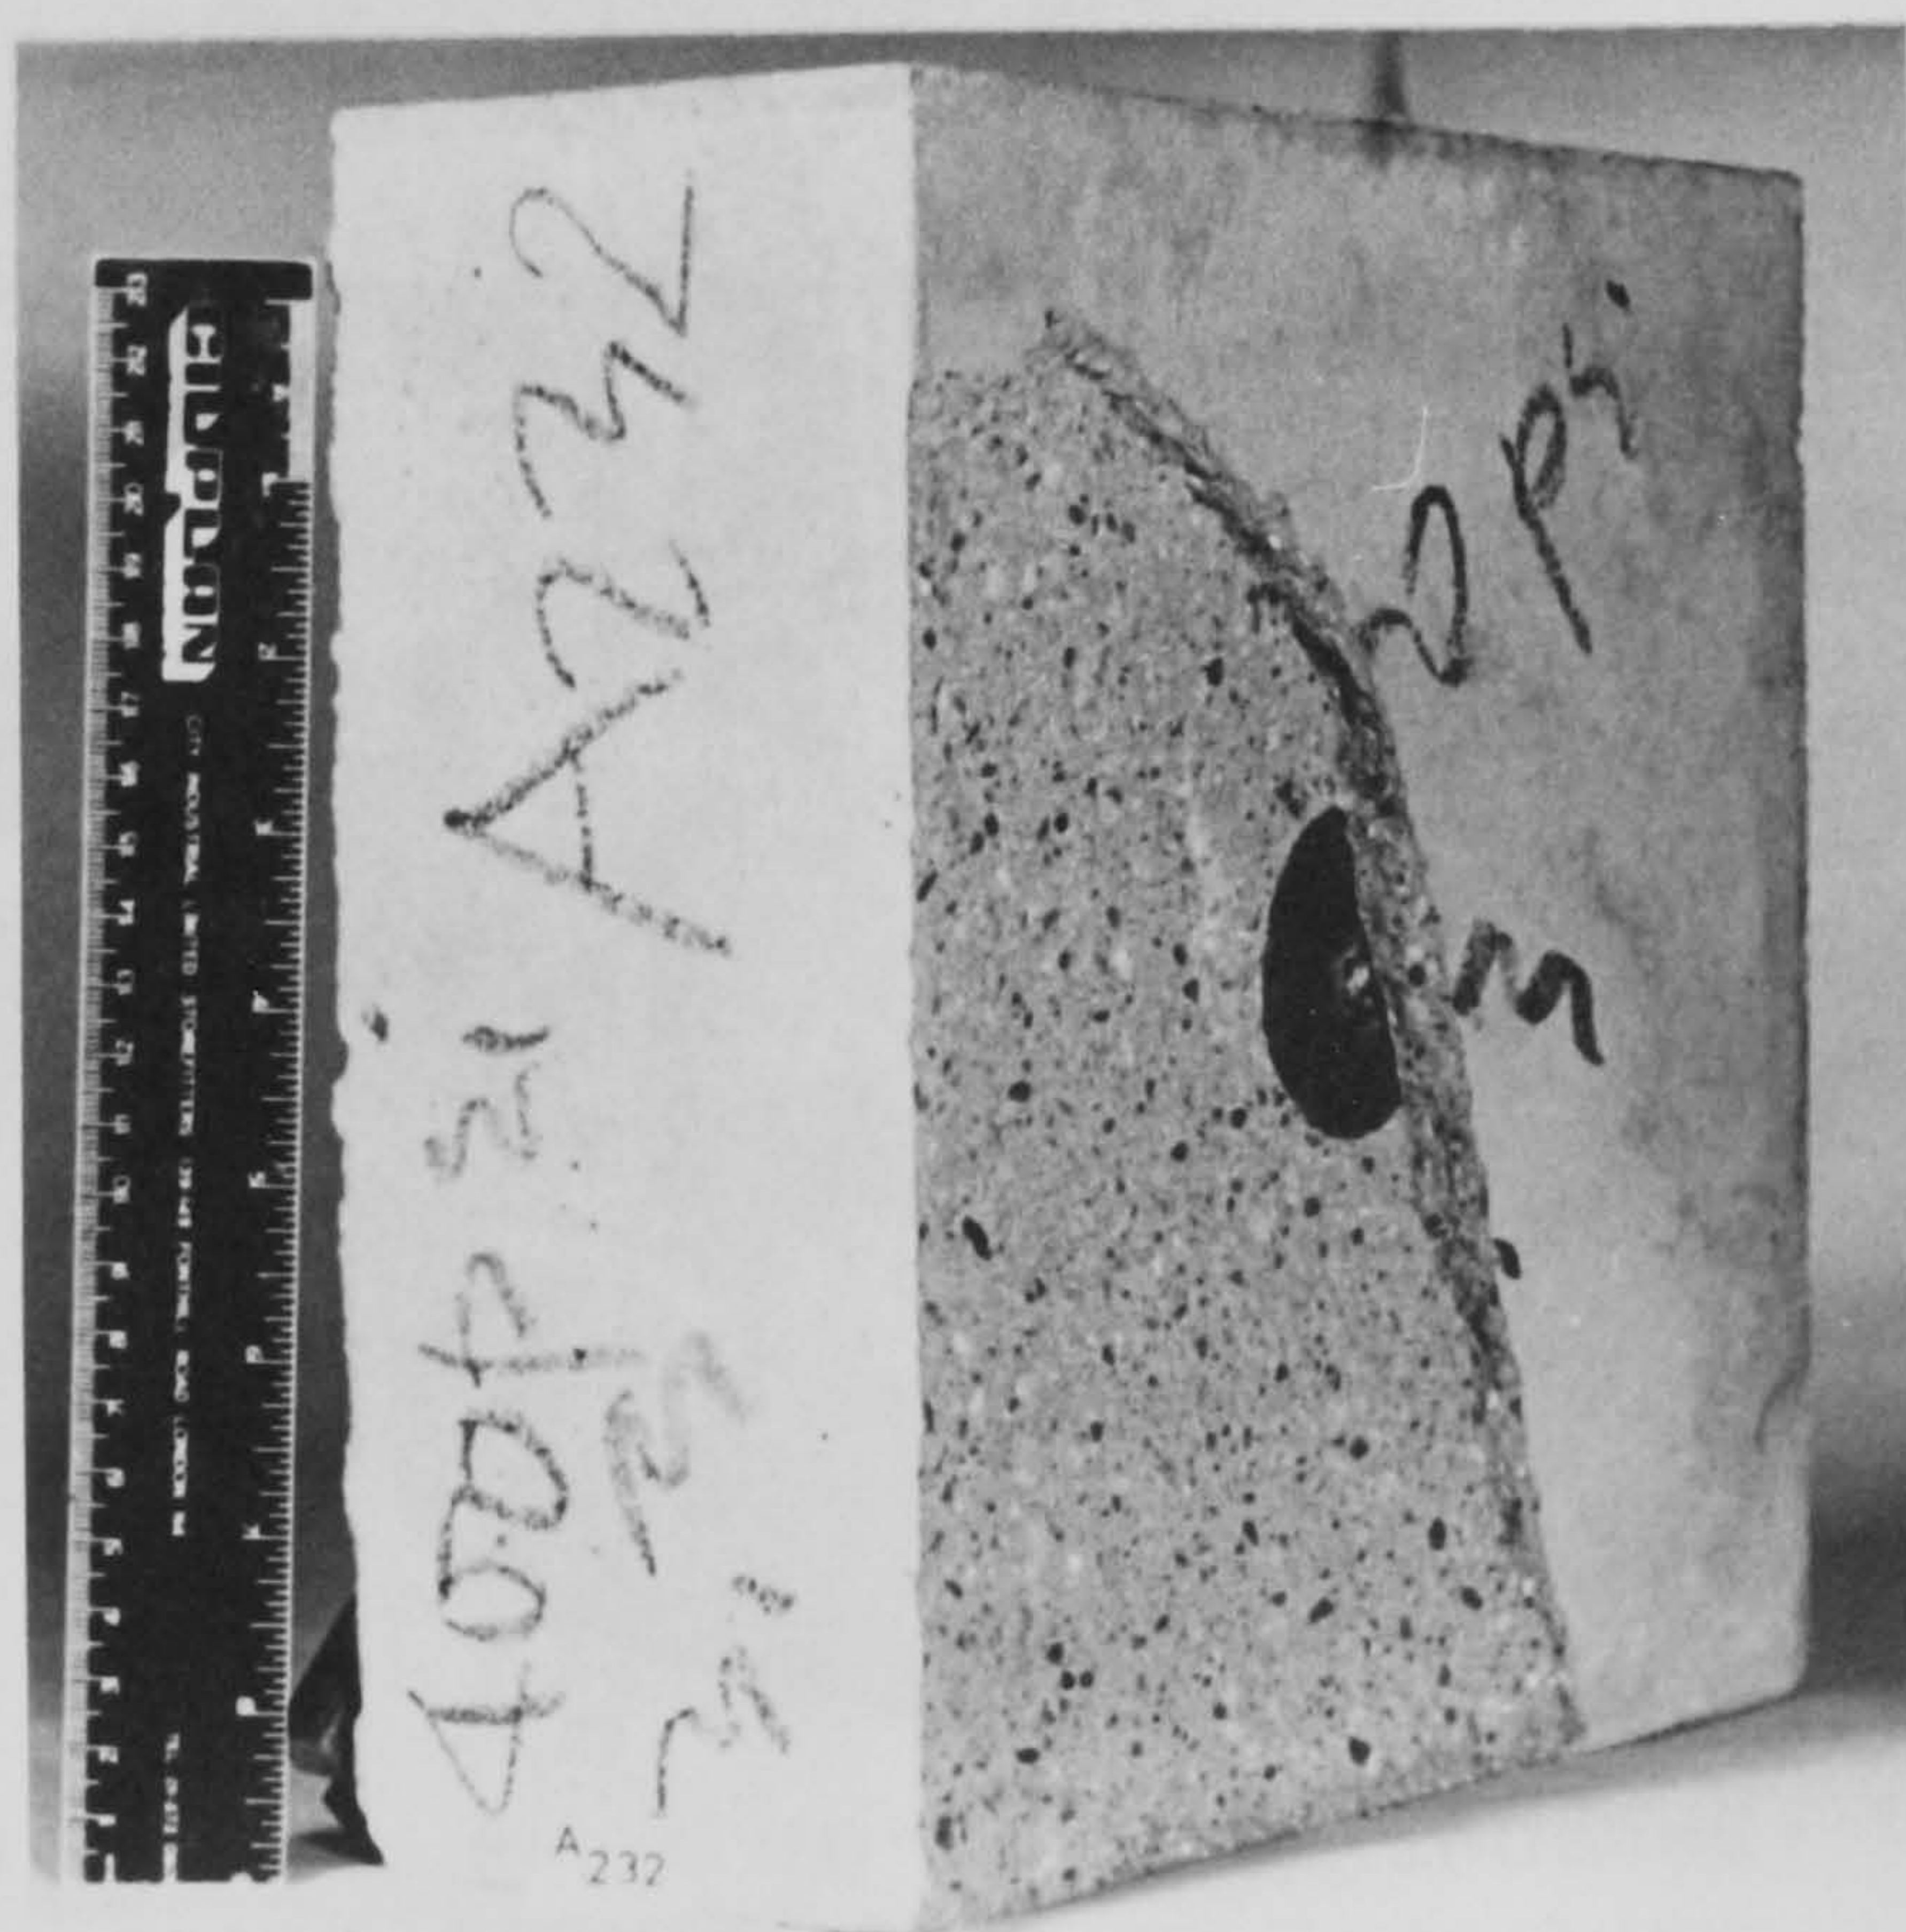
PRISMATIC SPECIMEN AFTER TEST
